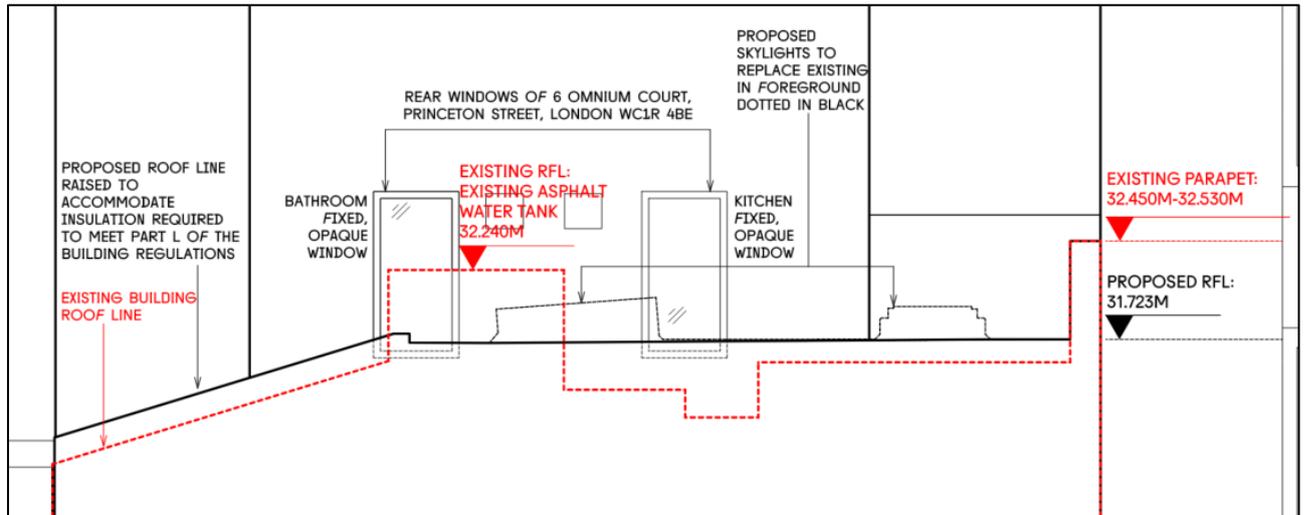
As built roof section with previous roof overlay in red demonstrating relationship with rear facing windows of Omnium Court.
